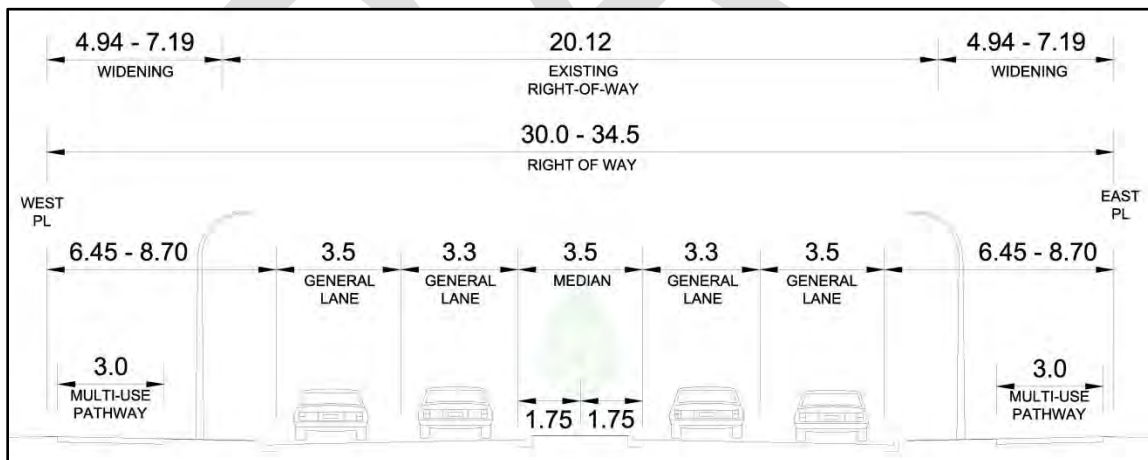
84 St Typical Cross Section – McKnight Blvd to Country Hills Blvd
